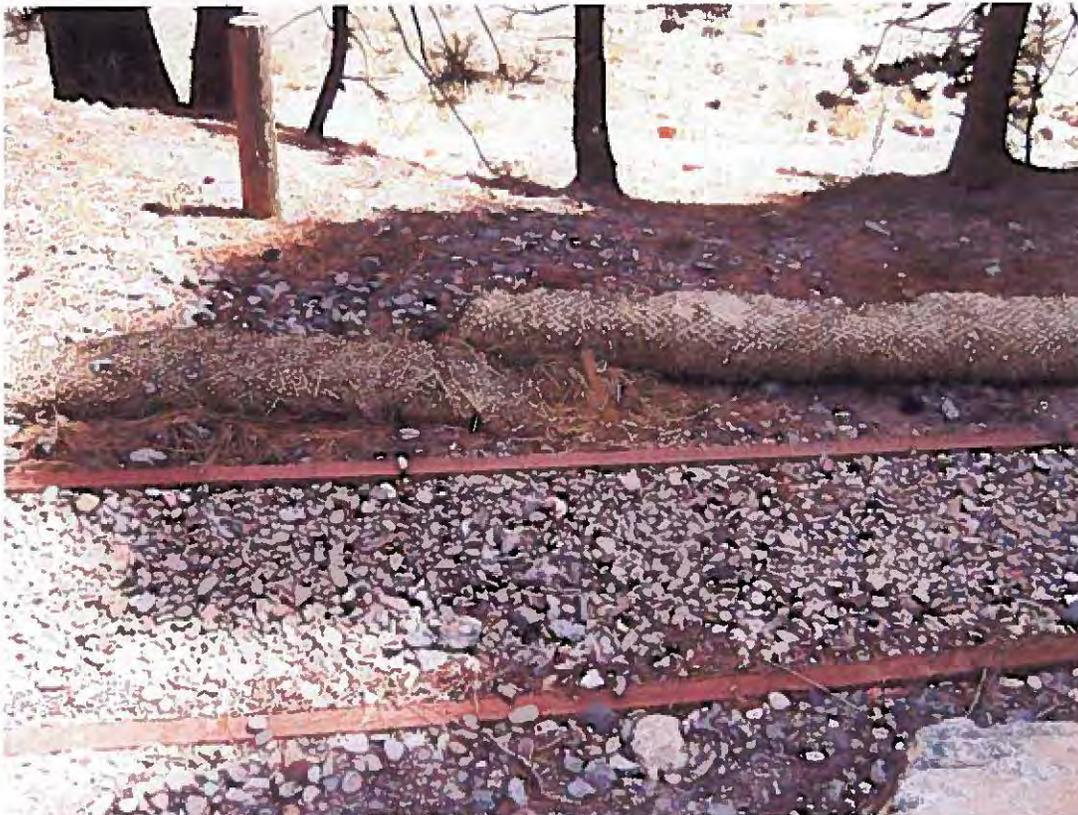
About 20 feet west of 2nd ramp west from office, looking south-southeast. The fiber roll has been degraded degraded and flattened.
